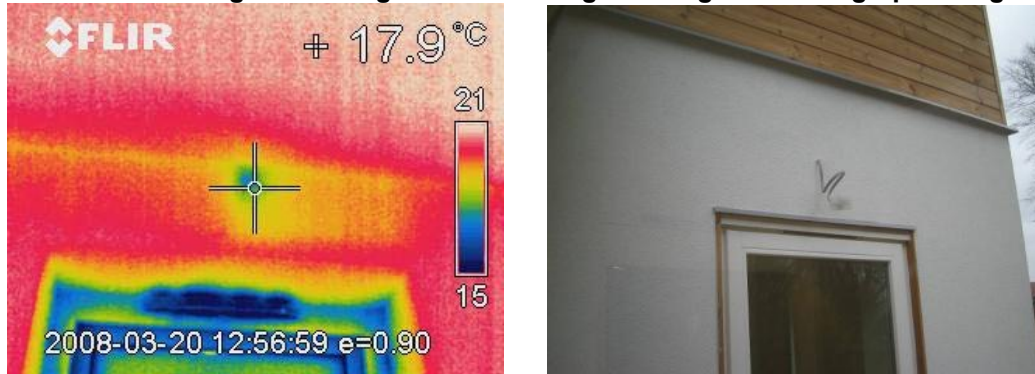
Leakage at Electrical Junctions Boxes where Wiring Penetrates External Wall
